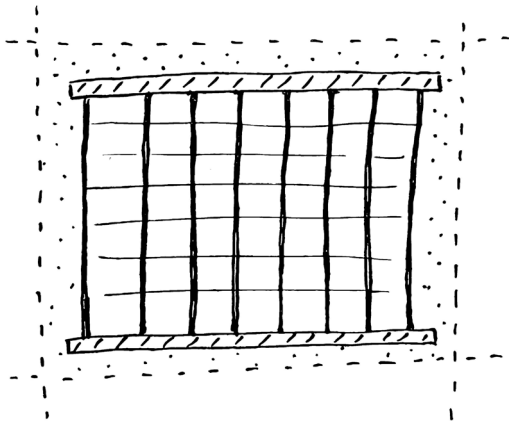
Static scheme of the proposed facade, a top and bottom beam, supported by the existing concrete facade. Pre-tensioned cables span between the beams
